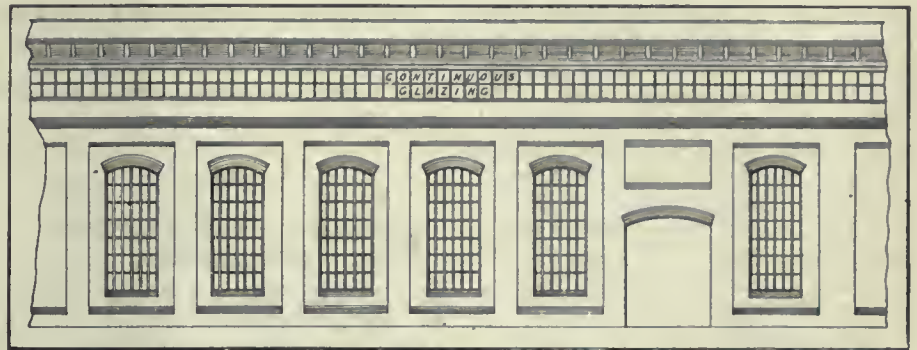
ELEVATION OF STEEL FOUNDRY, LANCASHIRE & YORKSHIRE RAILWAY, HORWICH.
